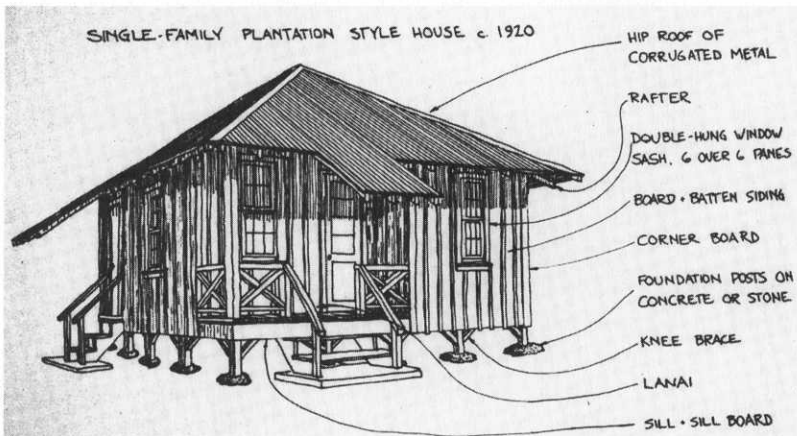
Exterior drawing made from the 1920 HSPA single-family house plan. (Grove Farm Homestead)
